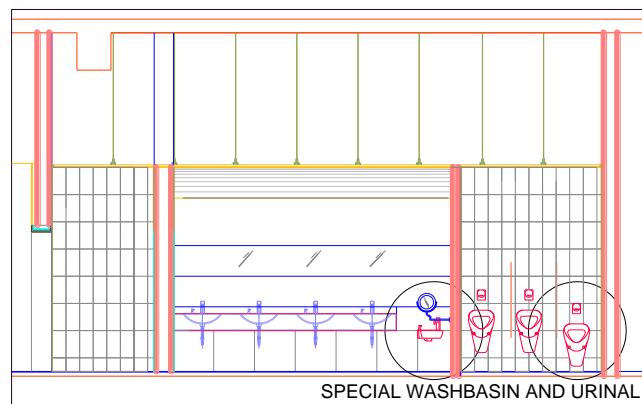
Typical section of the rest room showing dwarf's lavatory, in Forum Istanbul.
